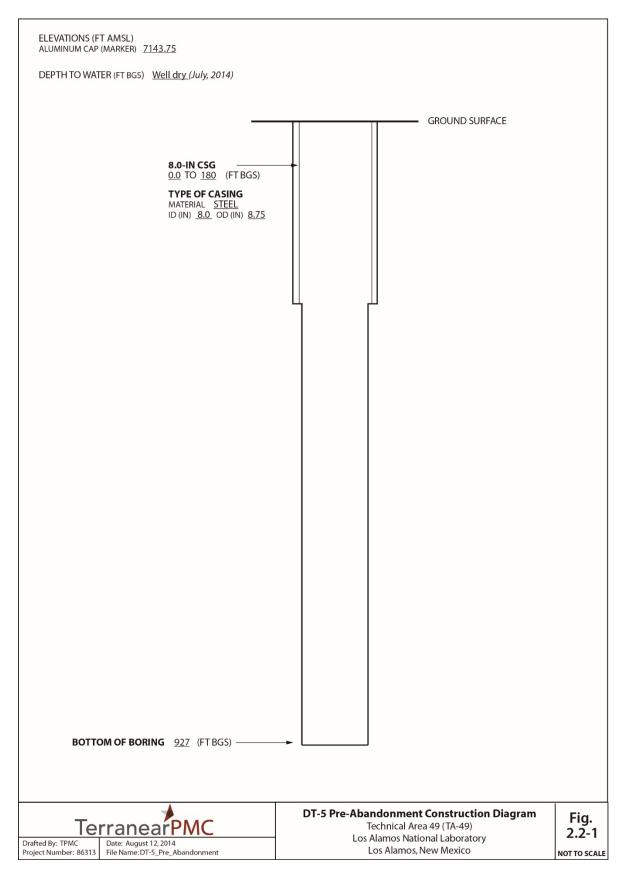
Test well DT-5 pre-abandonment construction diagram
